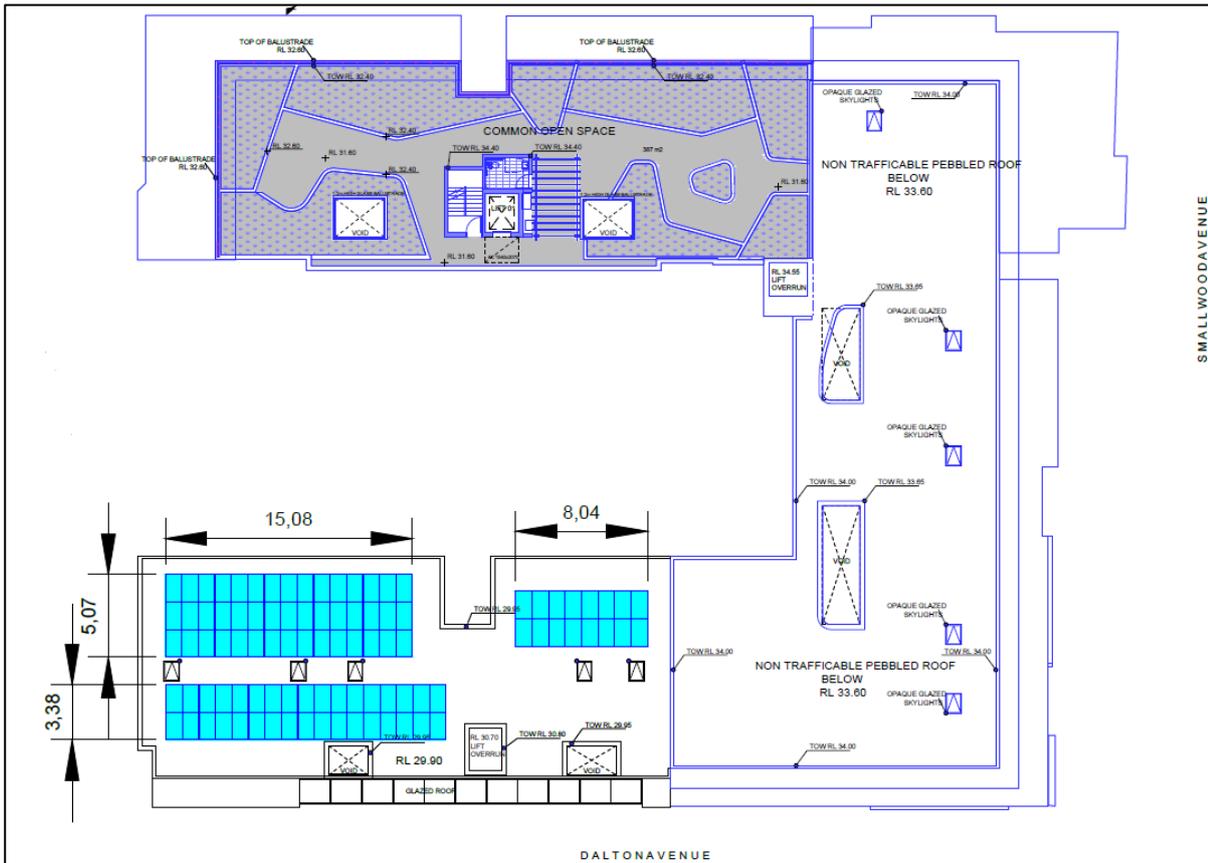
Roof plan (proposed solar panels highlighted in light blue)
